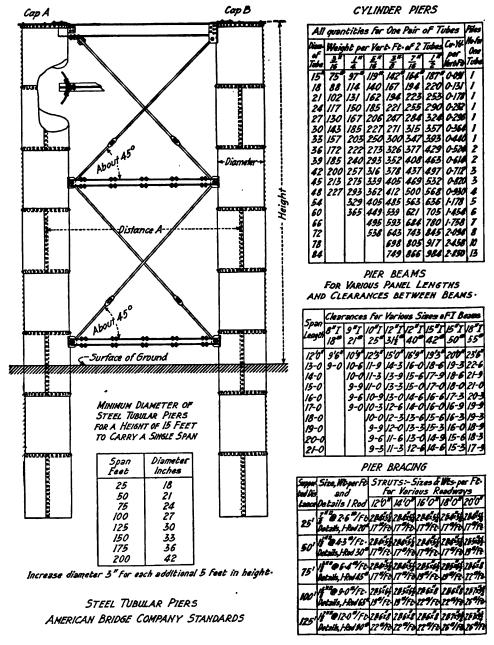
STEEL TUBULAR PIERS FOR HIGHWAY BRIDGES. AMERICAN BRIDGE COMPANY.
